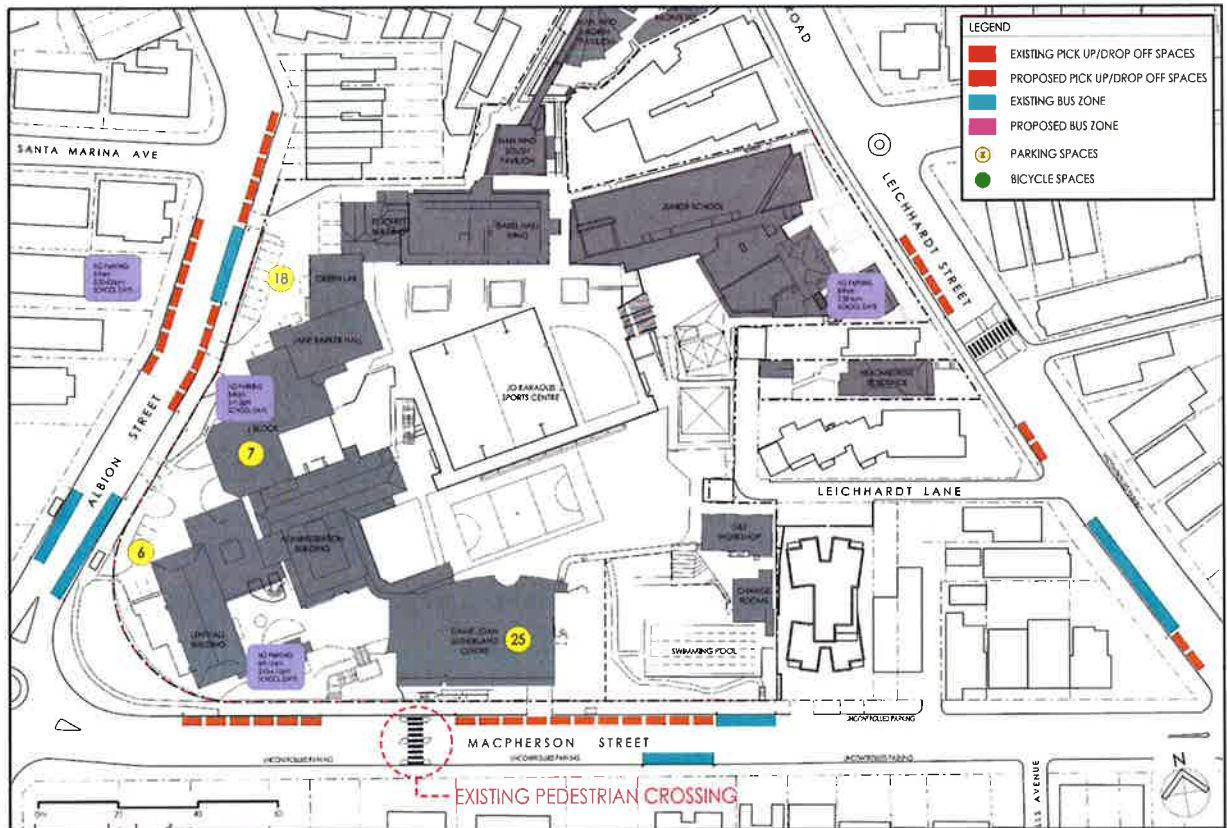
Previous drop-off/pick-up arrangements at Leichhardt Street
